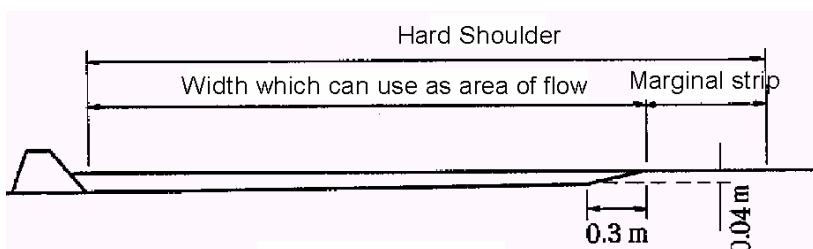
Asphalt Concrete Curb and Cross-sectional Area of Flow
